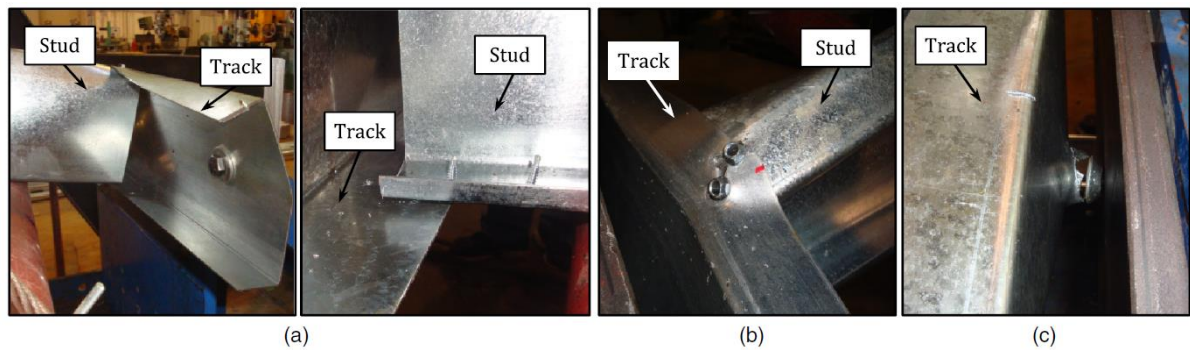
End-connection failure modes: (a) screw shear failure; (b) screw tilting and bearing failure; (c) bolt pullover failure (Bondok et al., 2015).
